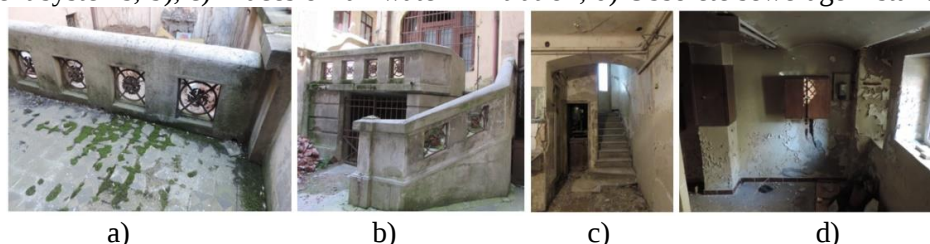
Structural survey: a) floor 1; b) floor 2 [122]
